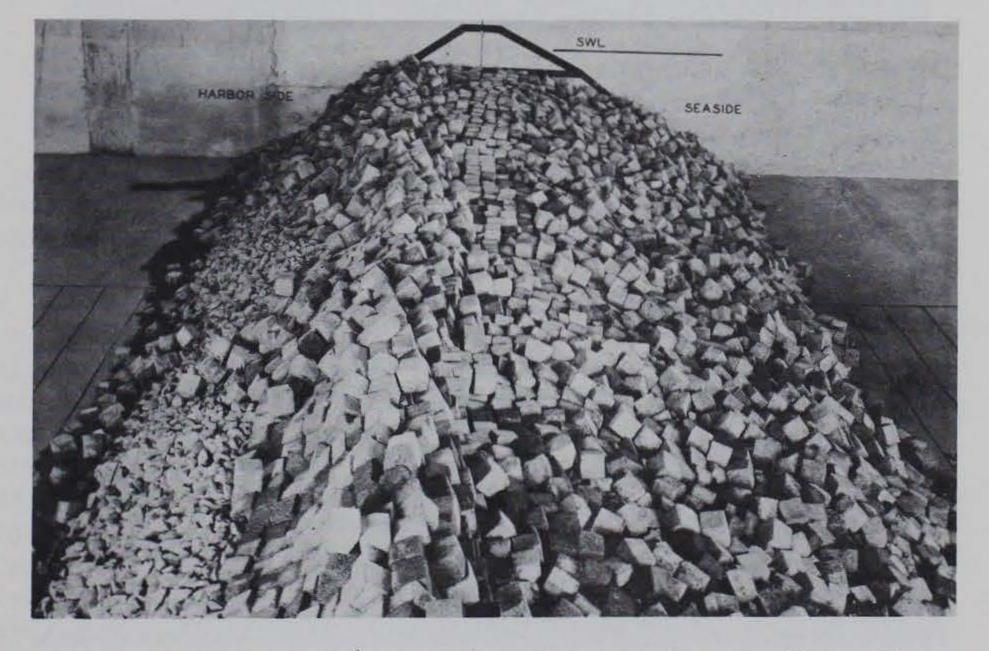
Test series 4, complete breakwater section after 21-ft wave attack, class A stone of molded concrete blocks
